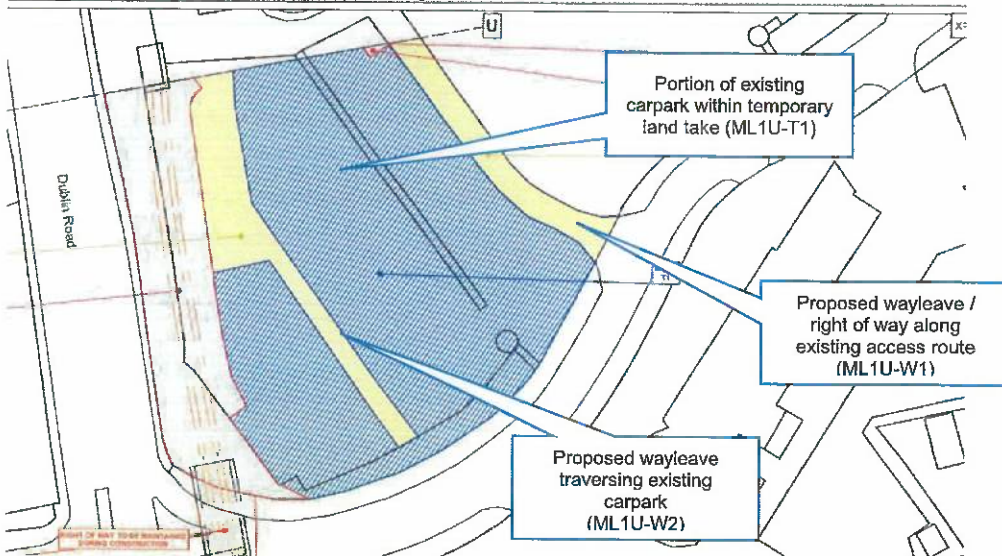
Extract from drawing 'Railway Works MetroLink – Property Details Airside Shopping Centre (Sheet 2 of 2)' – permanent land take in grey, temporary land take in blue, and proposed wayleaves in yellow
